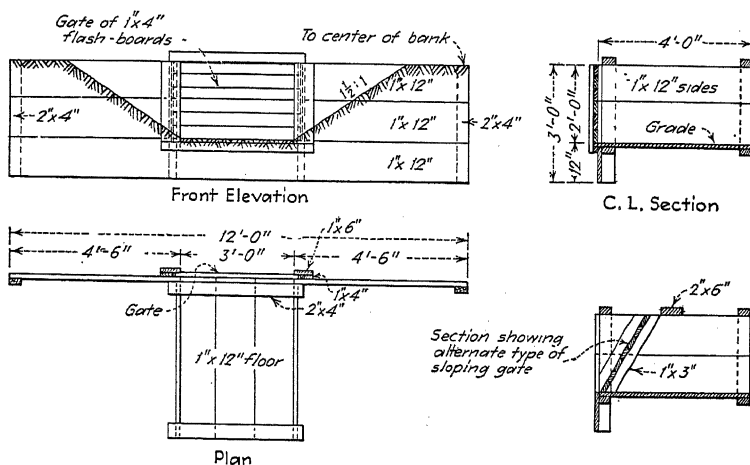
Check gate with side walls and floor for 3-ft. ditch using 1-in. lumber.
